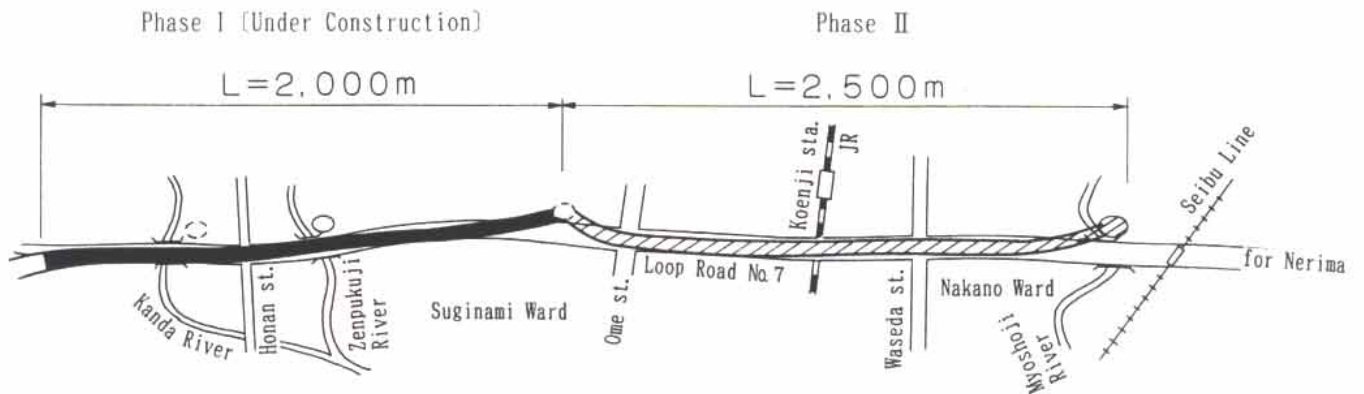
Plan of Underground River beneath Loop Road No. 7
